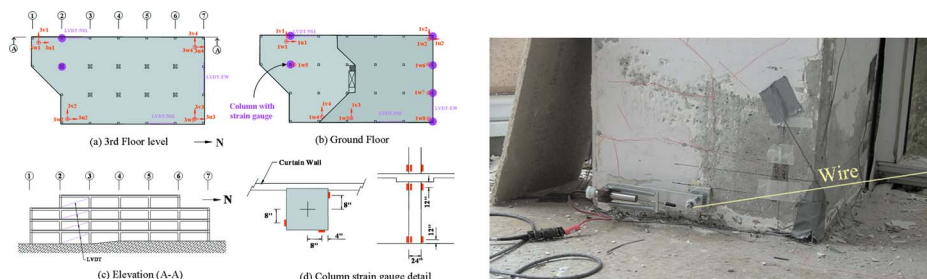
Instrumentation plan of (a) third floor (typical), (b) Ground floor, (c) West elevation, (d) location of column strain gauge, and (e) LVDT set up.
